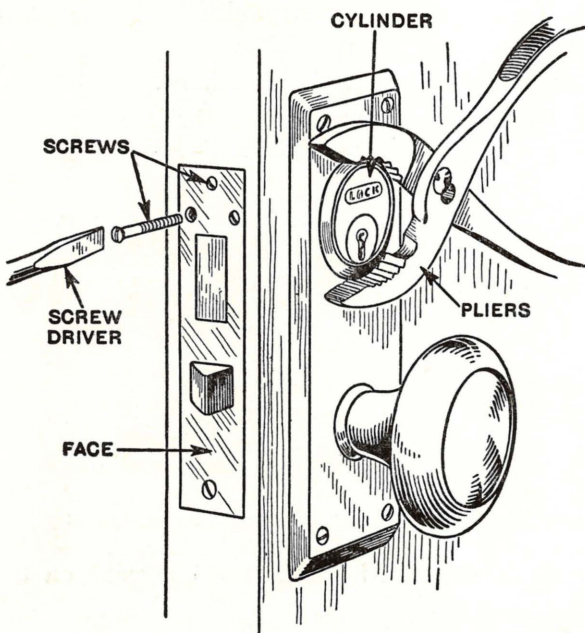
The cylinder may be removed with a screwdriver and a pair of pliers
